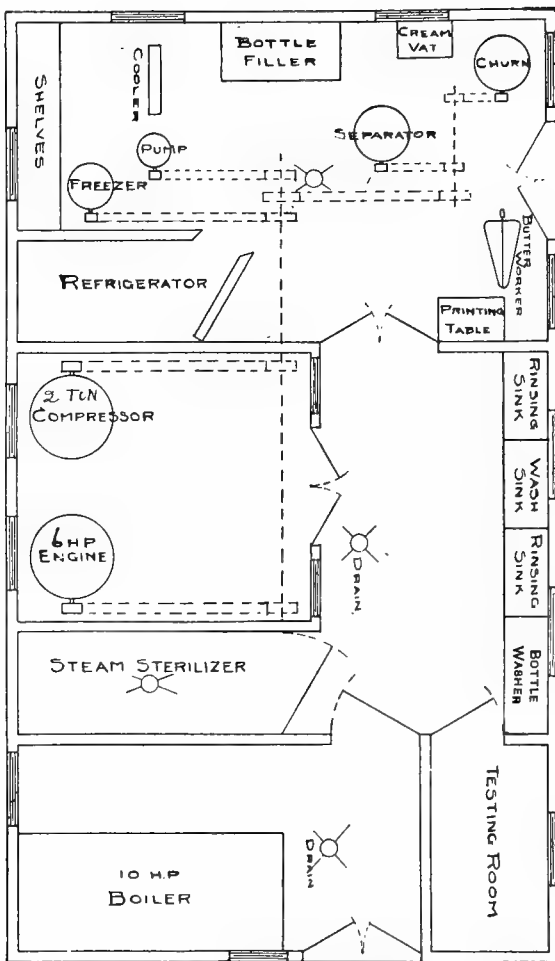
Floor Plan of Dairy House Suitable for Forty to Eighty Cows. (Mechanical Refrigeration.) 18'x30'.
